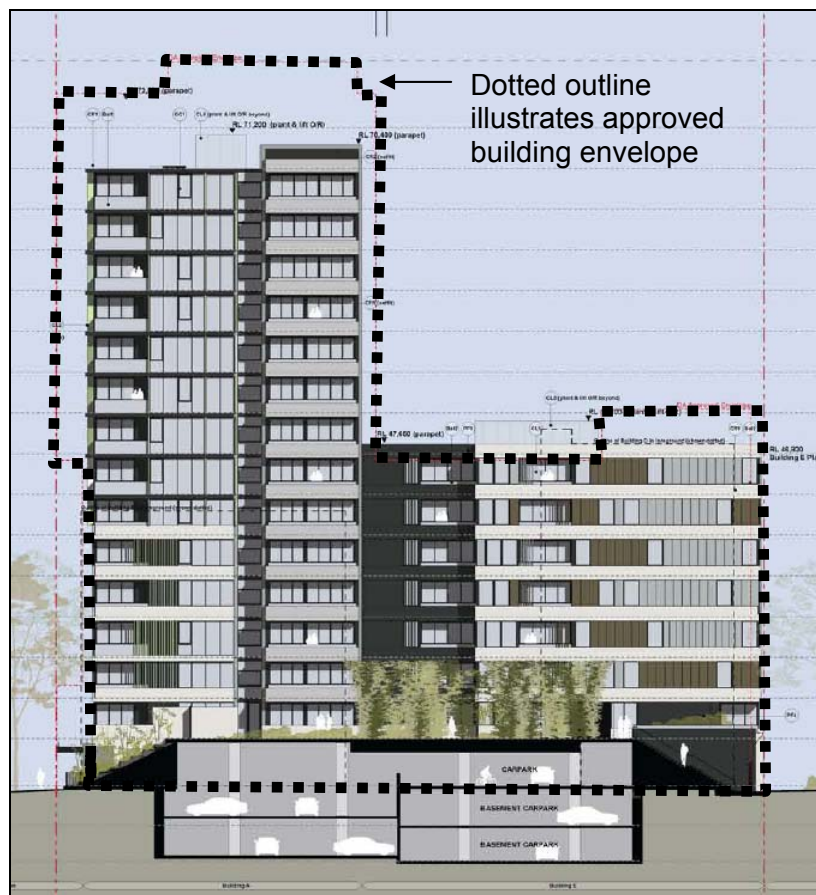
The reduced envelope and floorplate of Building A from that approved in the previous DA scheme
